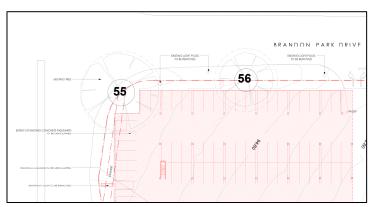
Edited extract of DA060 – Demolition ground plan (tree numbers added).
